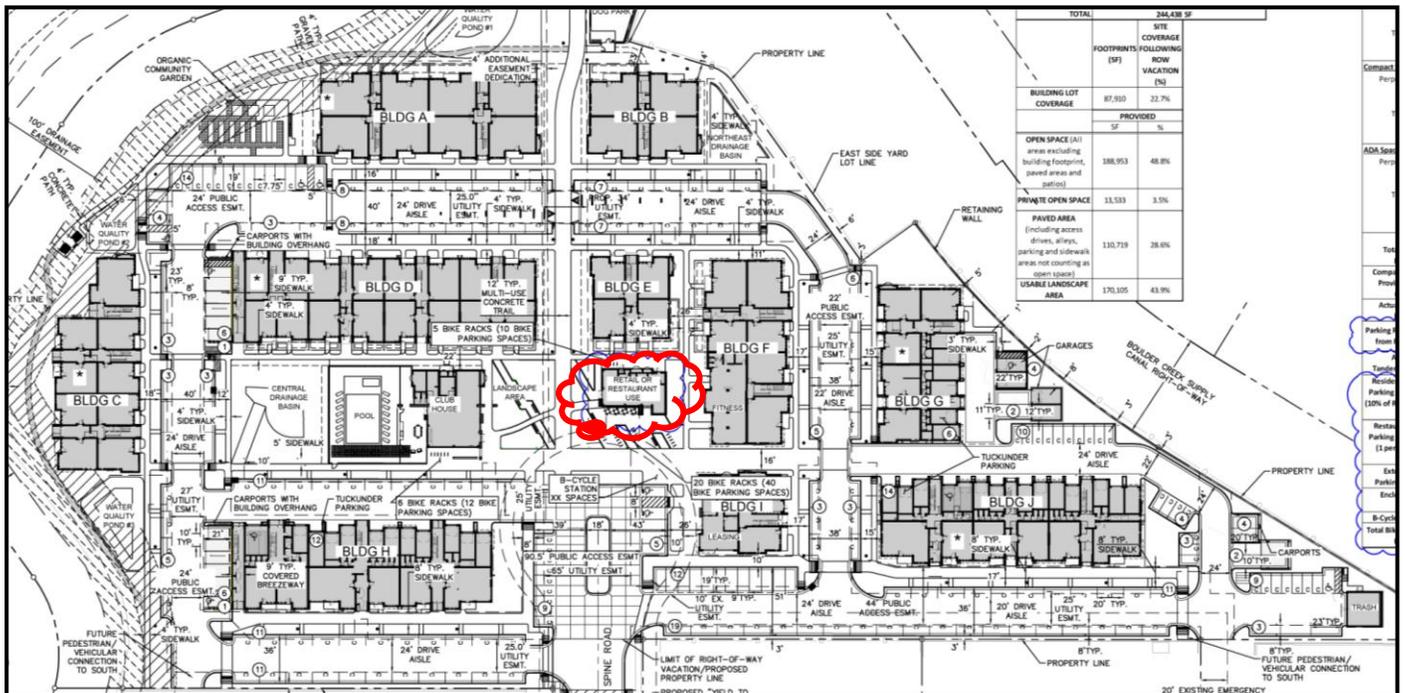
Site Plan showing location of existing tenant space proposed for new restaurant use
